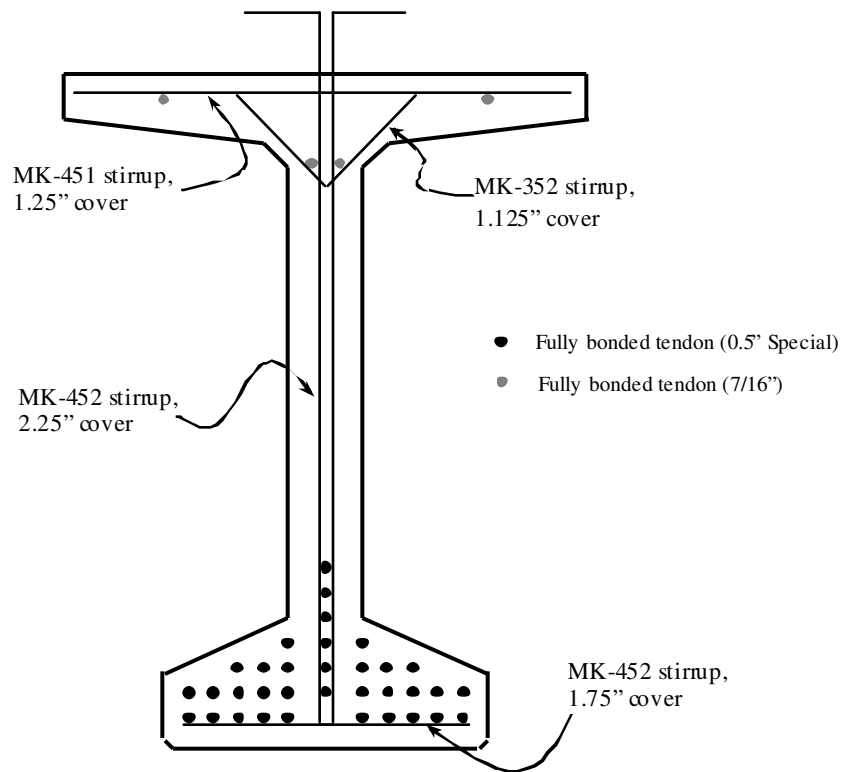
Cross-sectional Configuration of the Vertical Shear Reinforcement at Midspan (Swenson 2003a)
